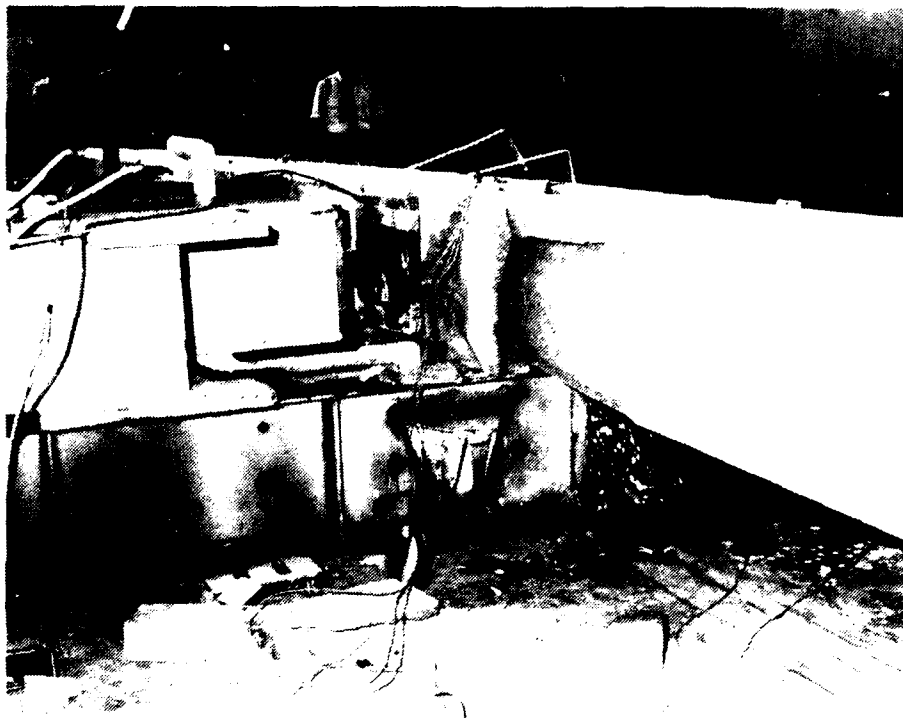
MK4 compression spalling at ultimate load.
